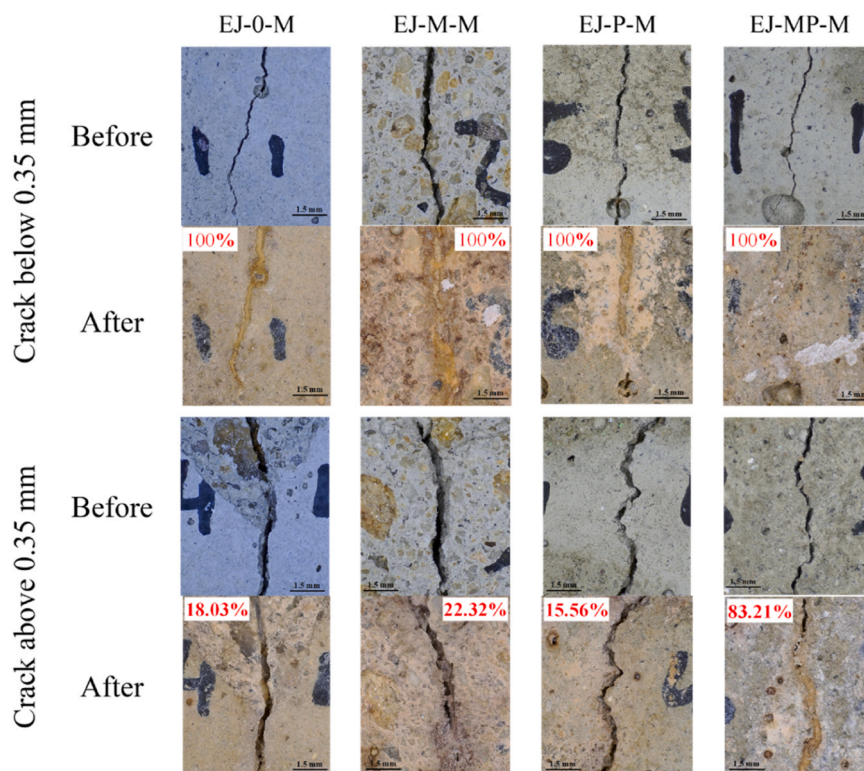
Cracks surface of cement mortar specimens before and after EICP(J) treatment.
